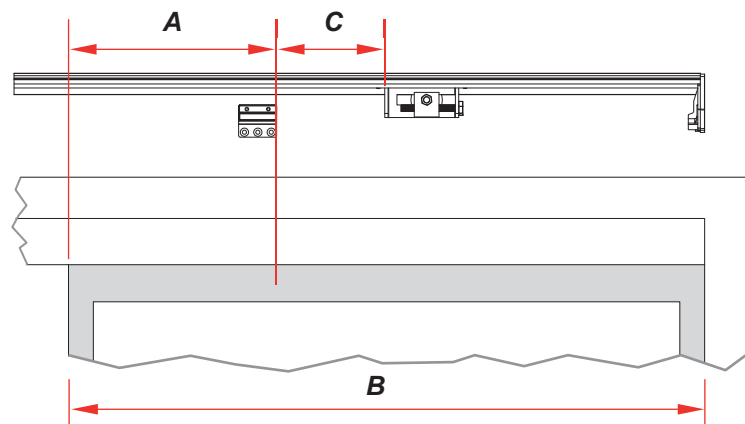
Bi-parting doors: belt tensioner and bottom bracket. The right side is shown with the right door open.
